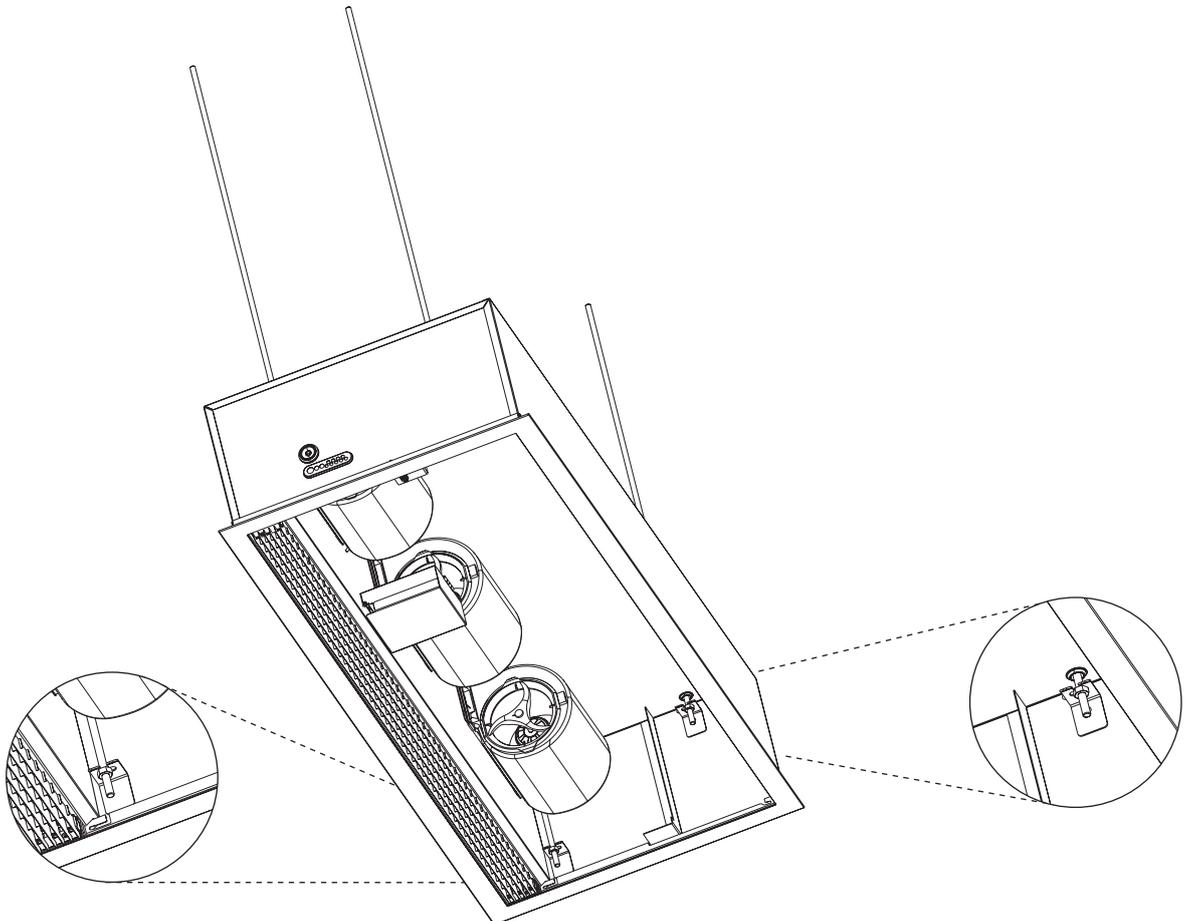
Mounting on threaded bars inside the unit. Note that the brackets are placed at different heights and therefore threaded rods should be of different lengths.
